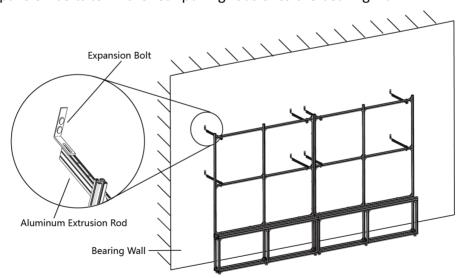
Fix the Rear Pulling Rods onto the Bearing Wall
